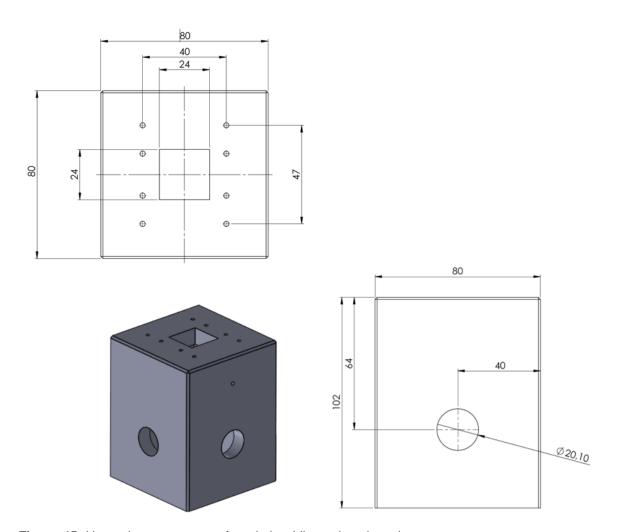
Hypercharger concrete foundation (dimensions in cm)
